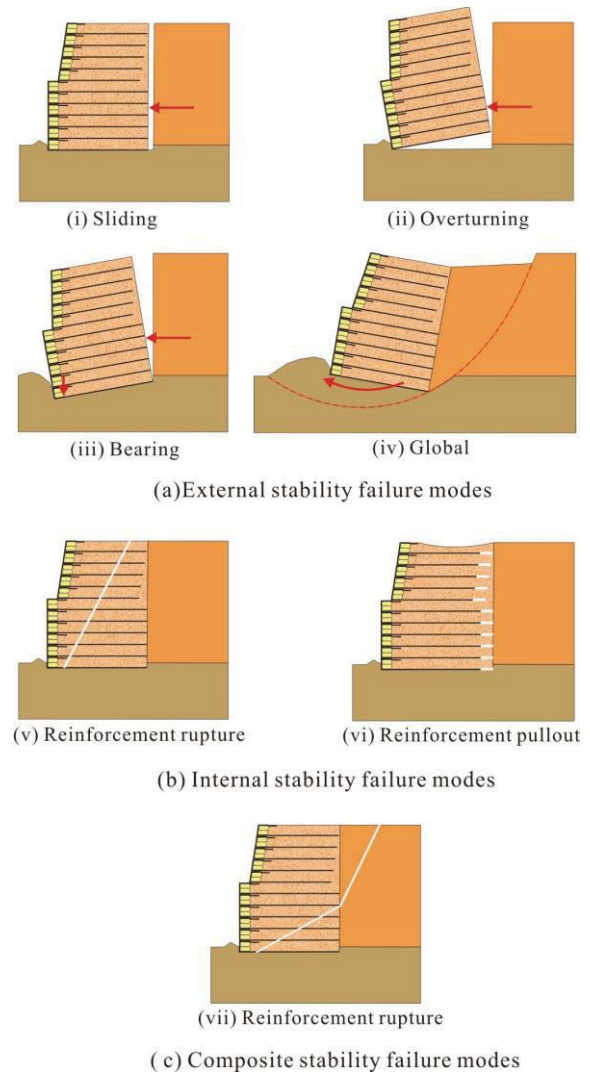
Possible modes of failure for reinforced soil retaining wall
